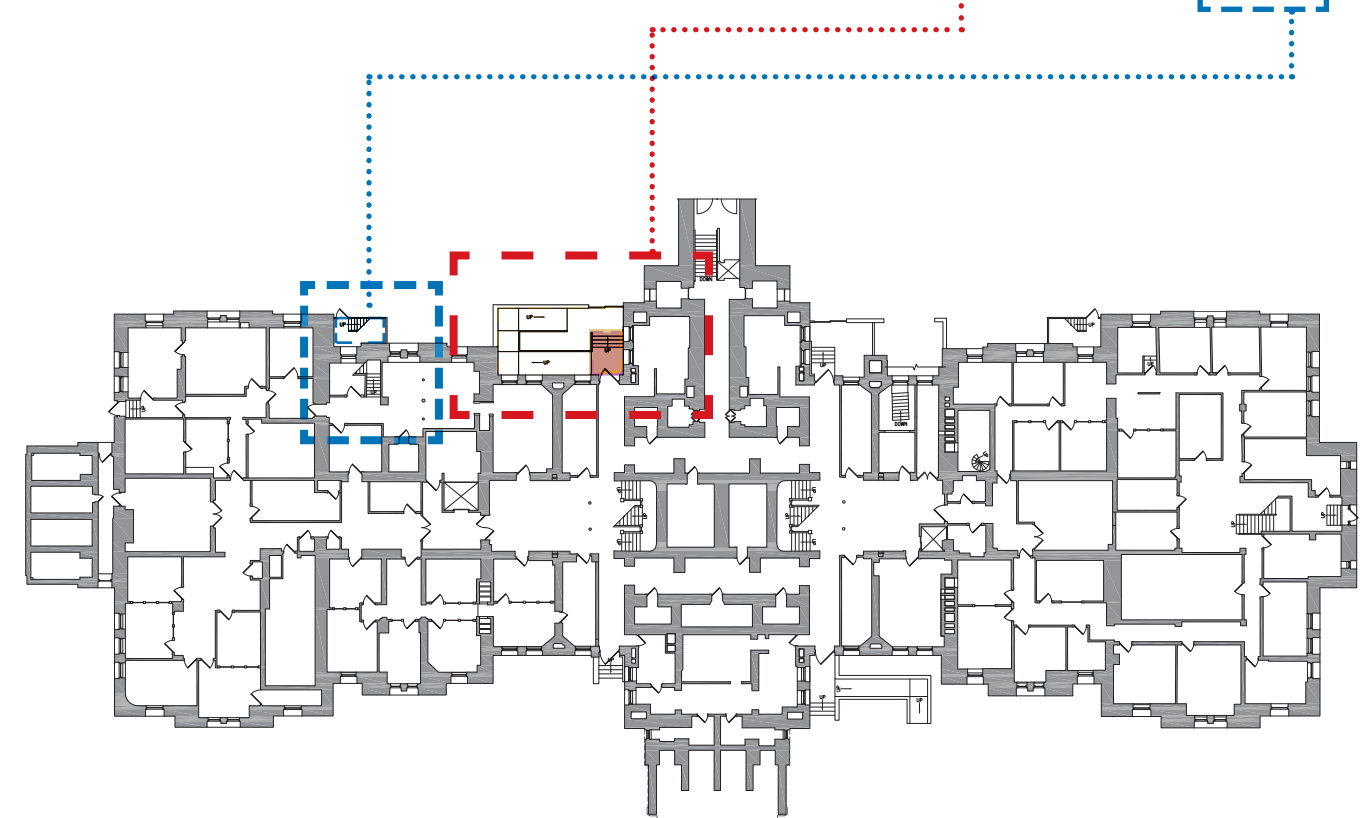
“As-Found” Basement Level Floor Plan.
